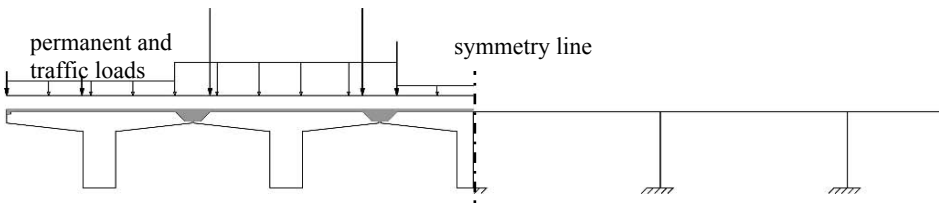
Transversal bridge section with UHPFRC layer, exemplary loading scheme and static system
